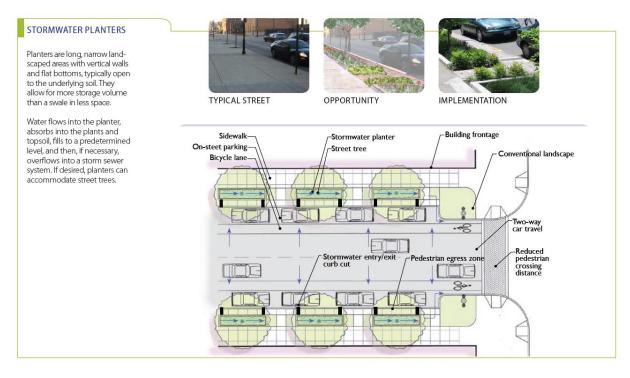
Green Streets with Stormwater Planters (EPA, 2009)
